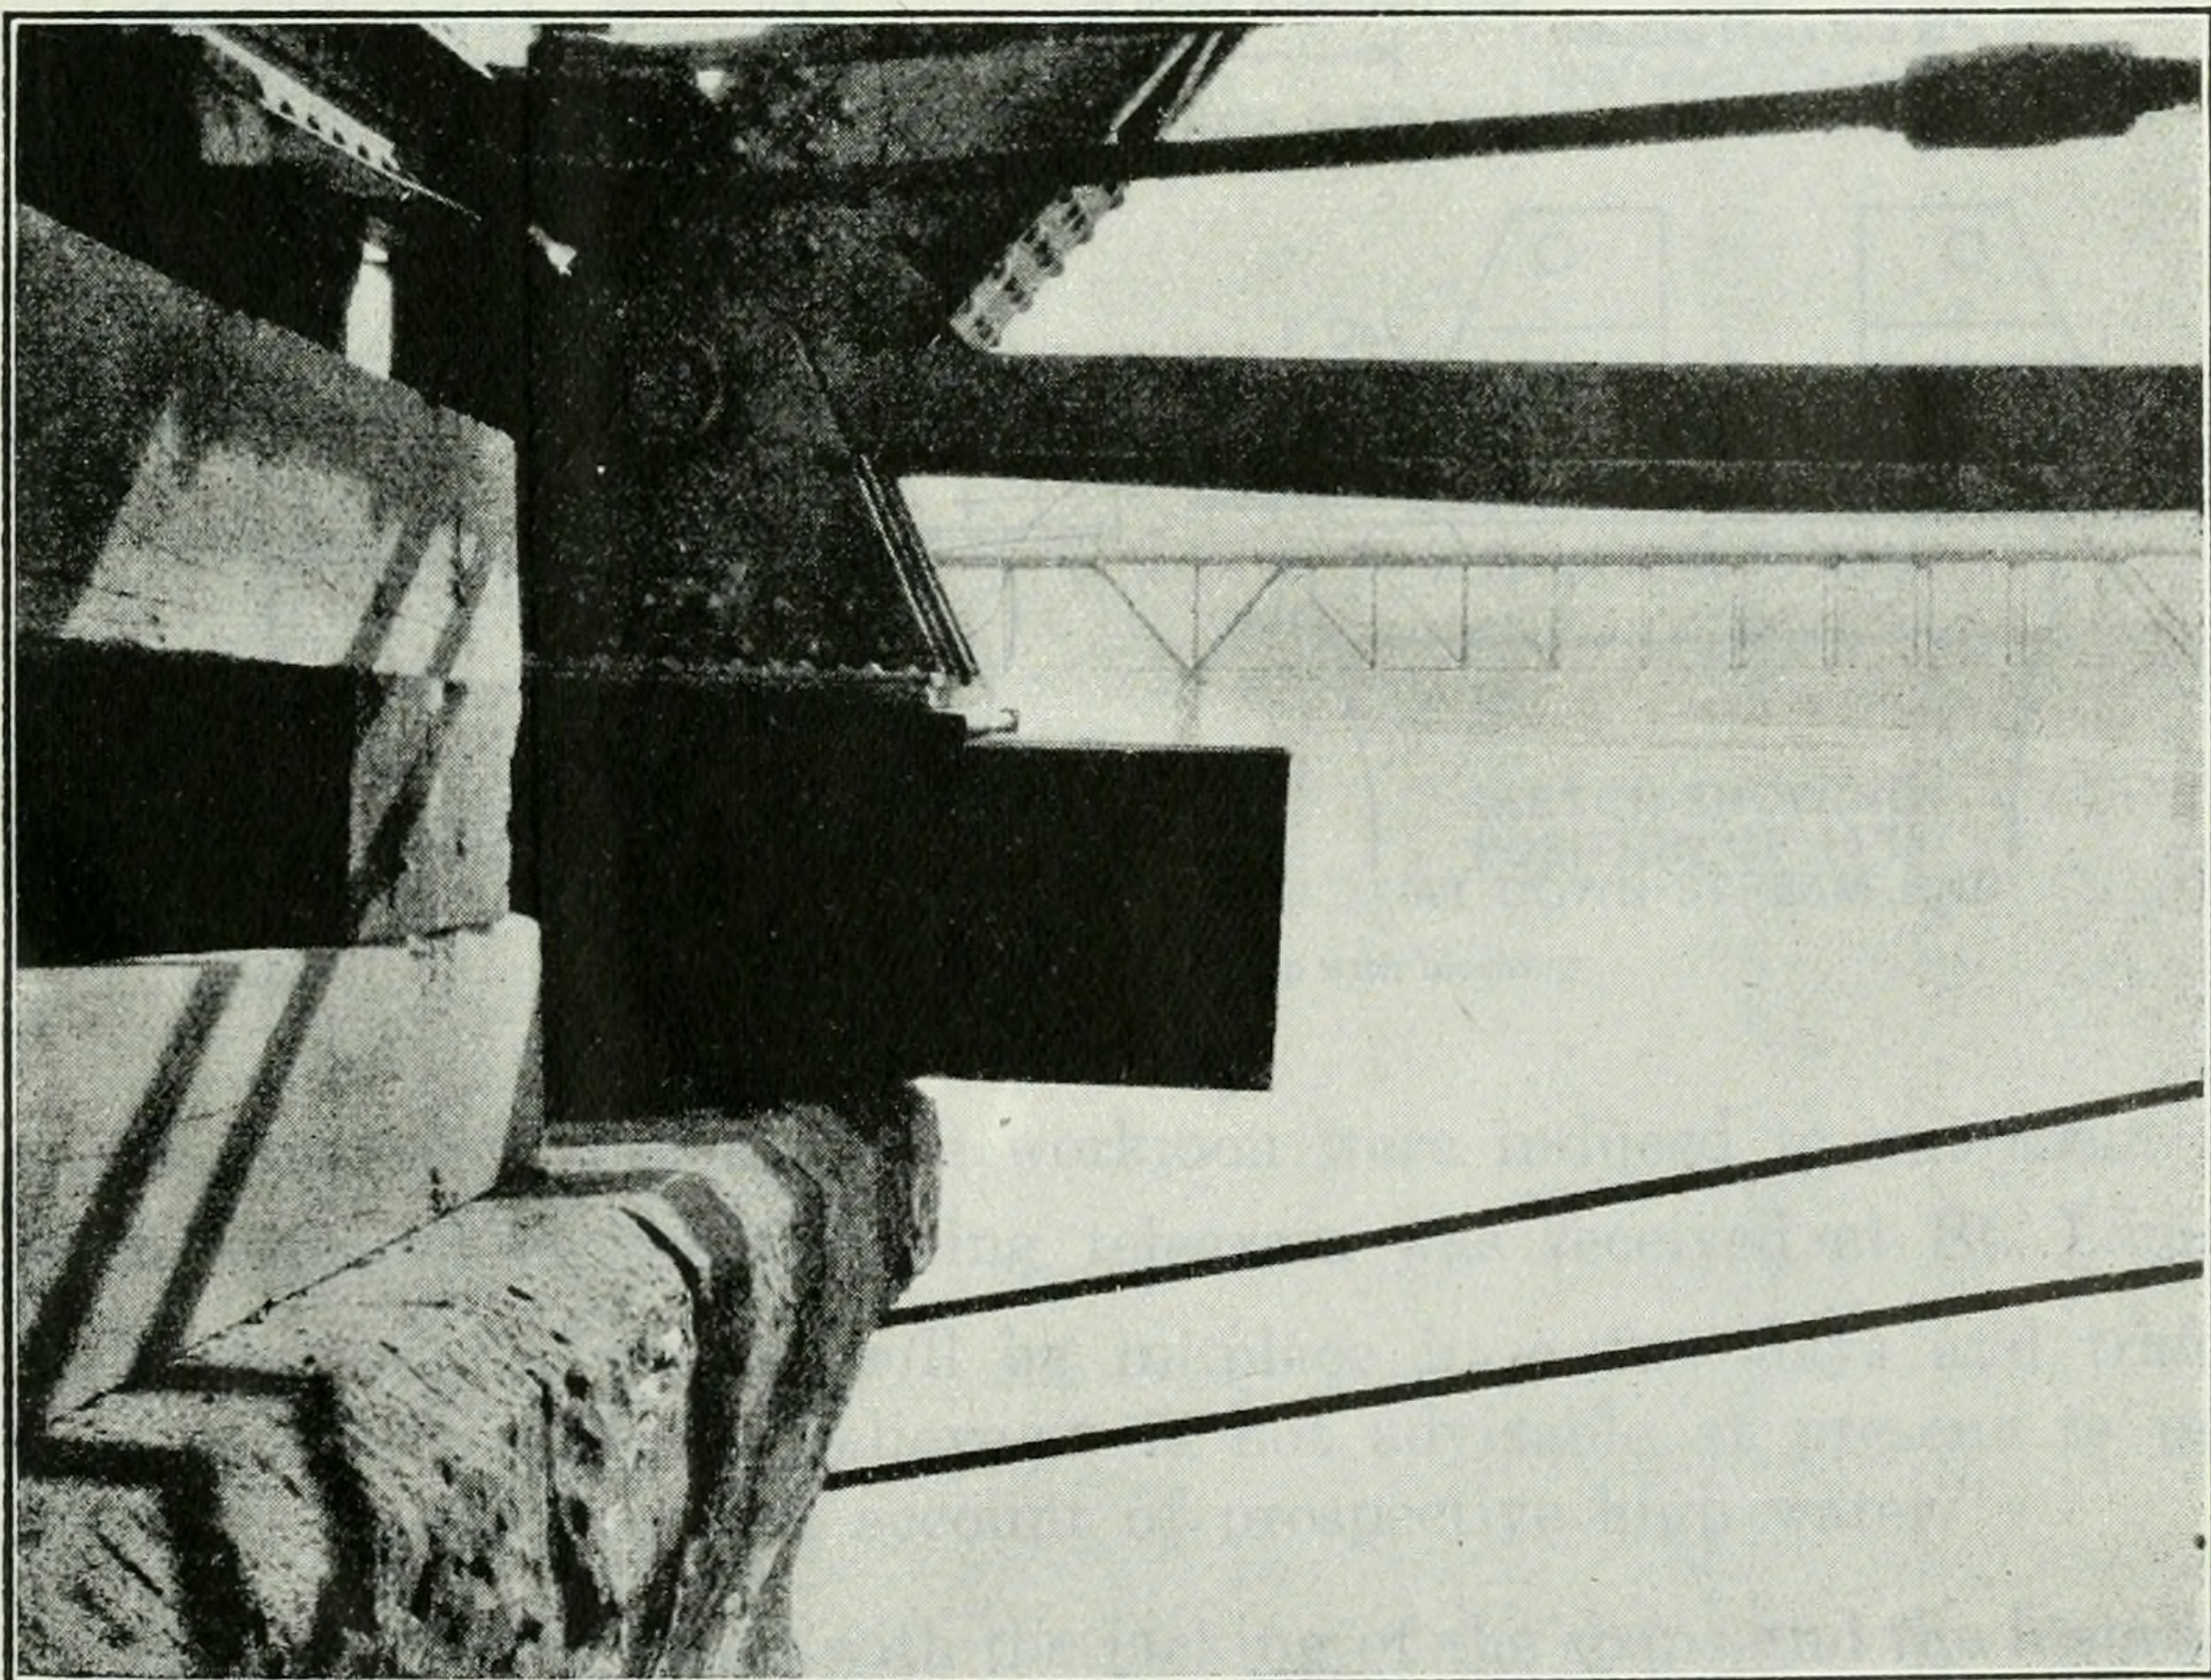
TRUSS SHOE ON I-BEAM GRILLAGE.
